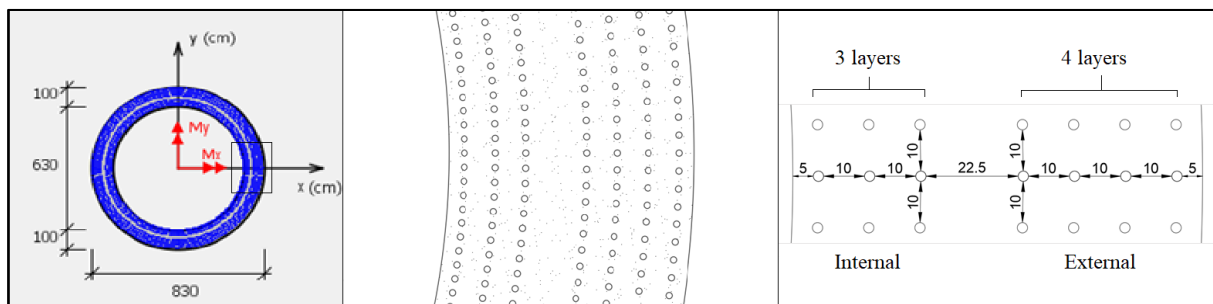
Left: Critical Section in “Pcalc!” [16]. Center: Zoomed cross-sectional view. Right: Detailed scheme of the reinforcement.
